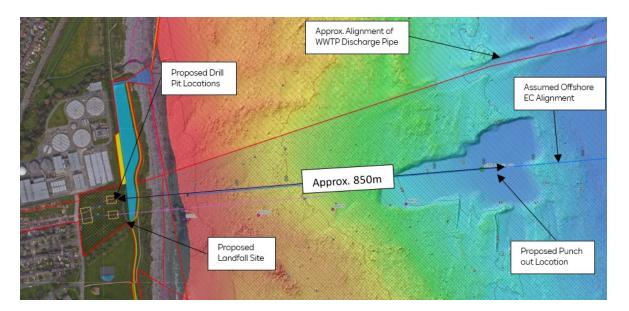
Schematic showing proposed punch out location from trenchless duct installation
